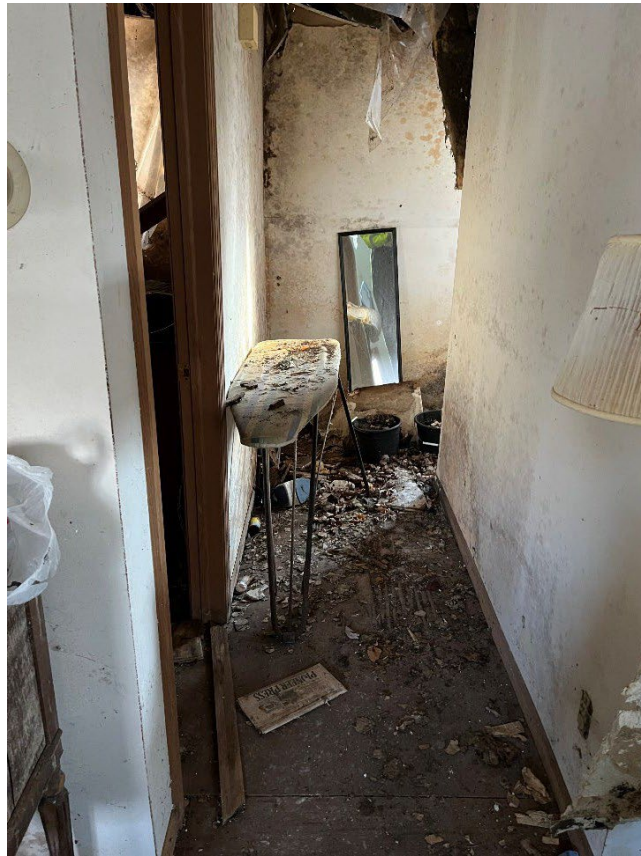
Ceiling in the front living room has collapsed due to deterioration
